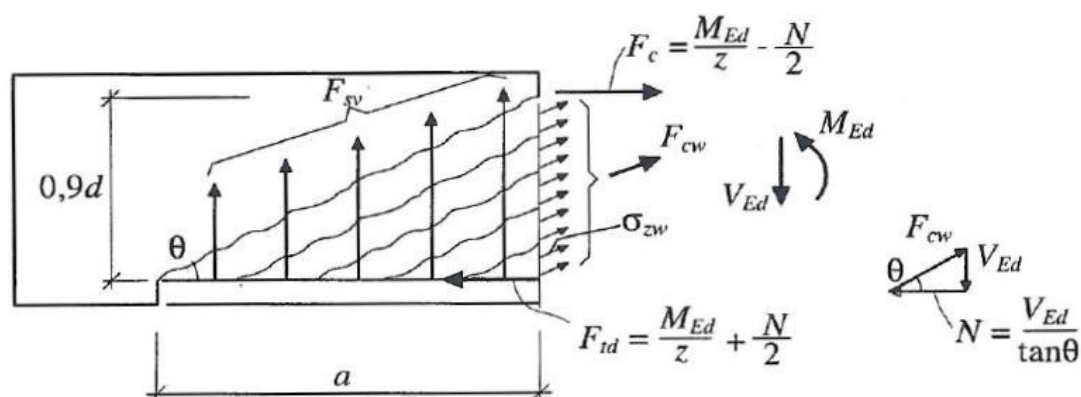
Truss model for calculation of the actual tensile force in a part of a slab with inclined shear cracks.
